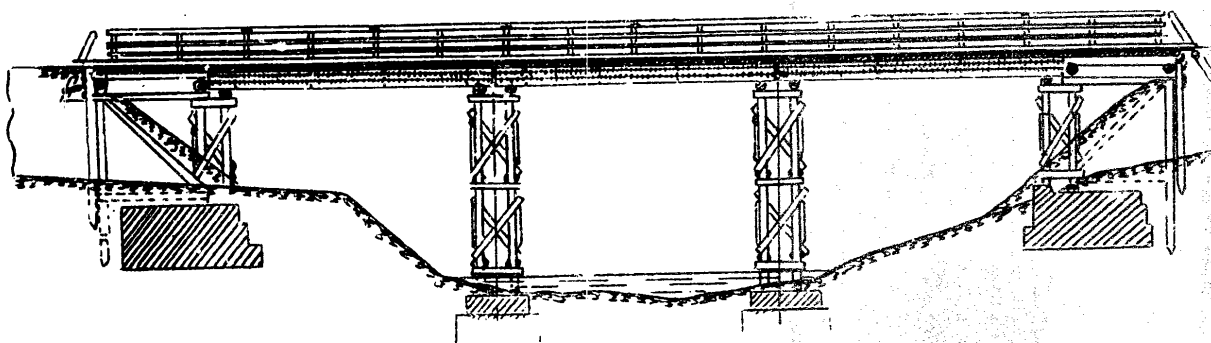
Temporary Repair of a Three-Span-Beam, Reinforced-Concrete Bridge
